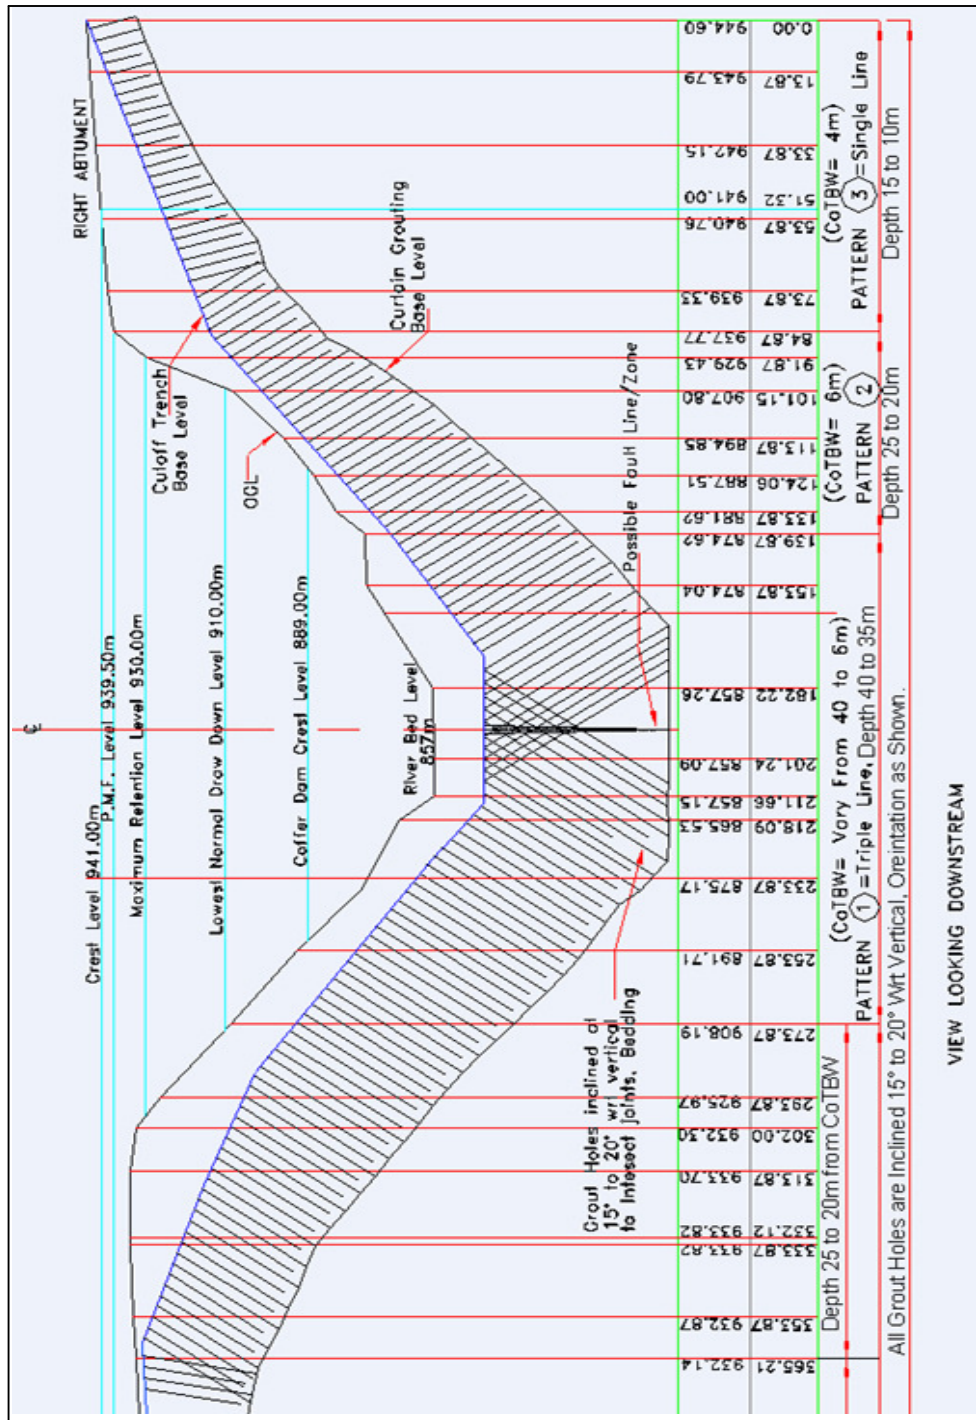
Curtaining grouting layout of Kesem Dam foundation grouting (source: WWDSE 2005c)
